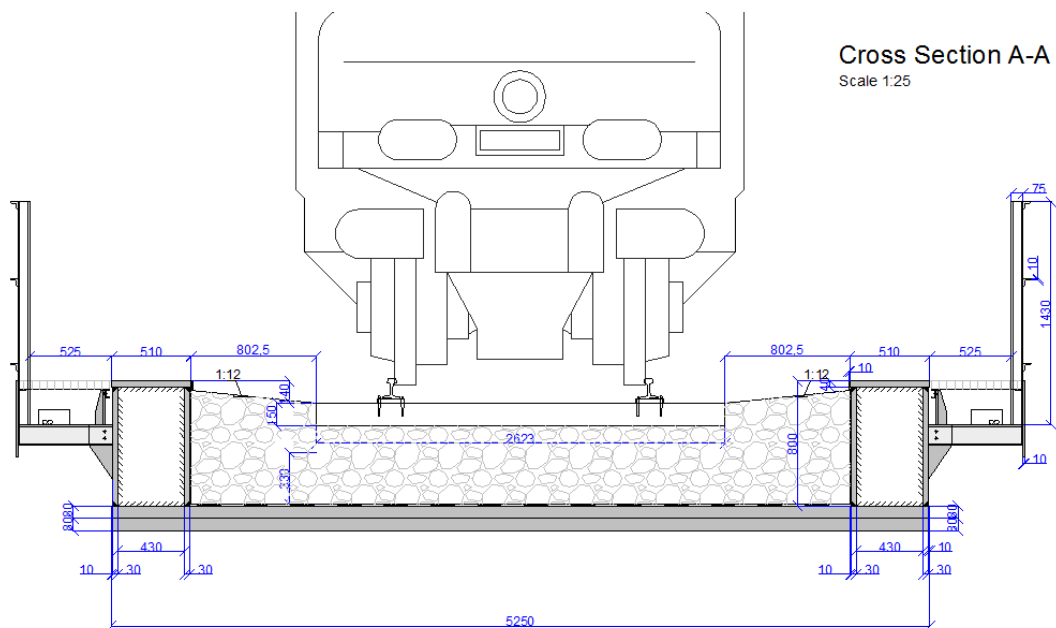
Cross section for 15 meters span bridge with bigger main girders
